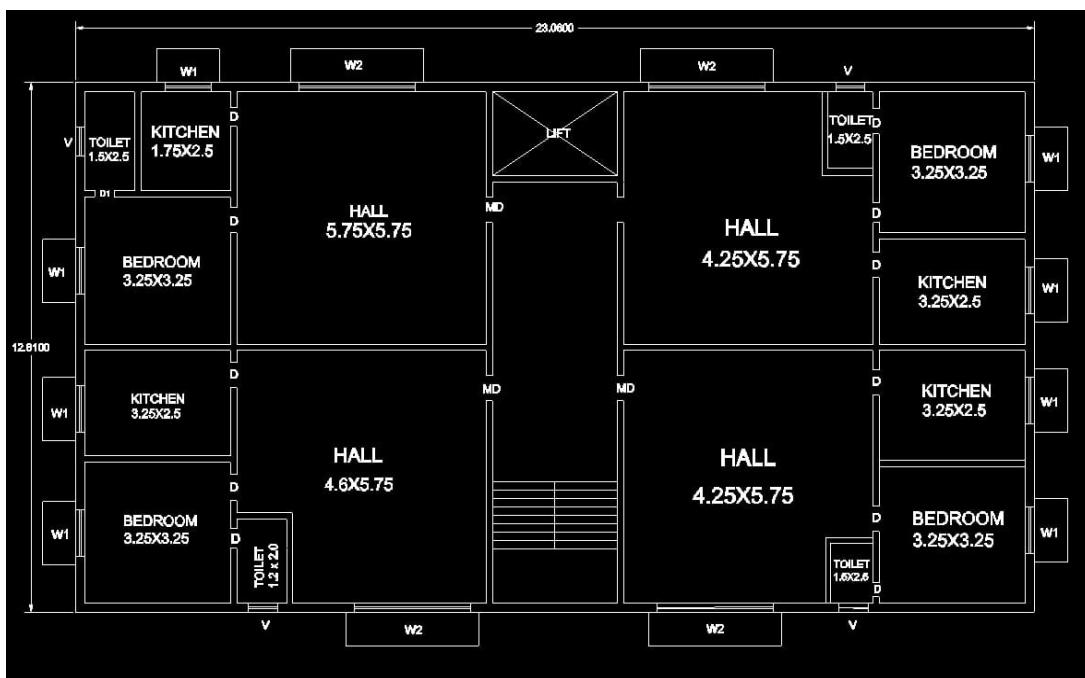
Floor plan (1st to 7th, 9th, 10th Floor)
